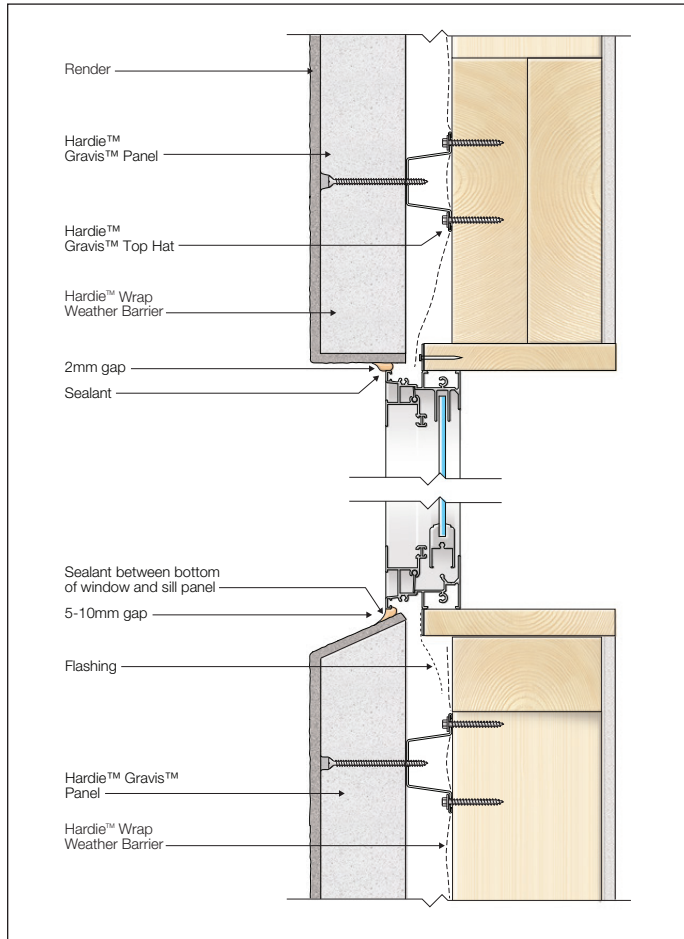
WINDOW HEAD AND SILL DETAIL
